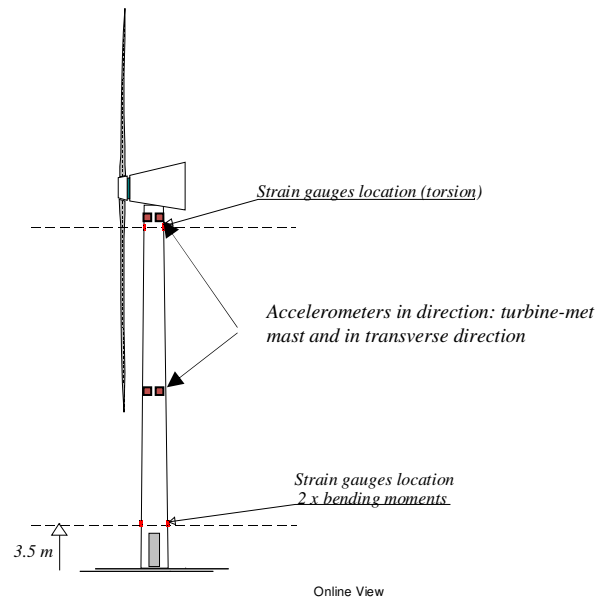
Structural load measurements on the welded tubular steel tower.
